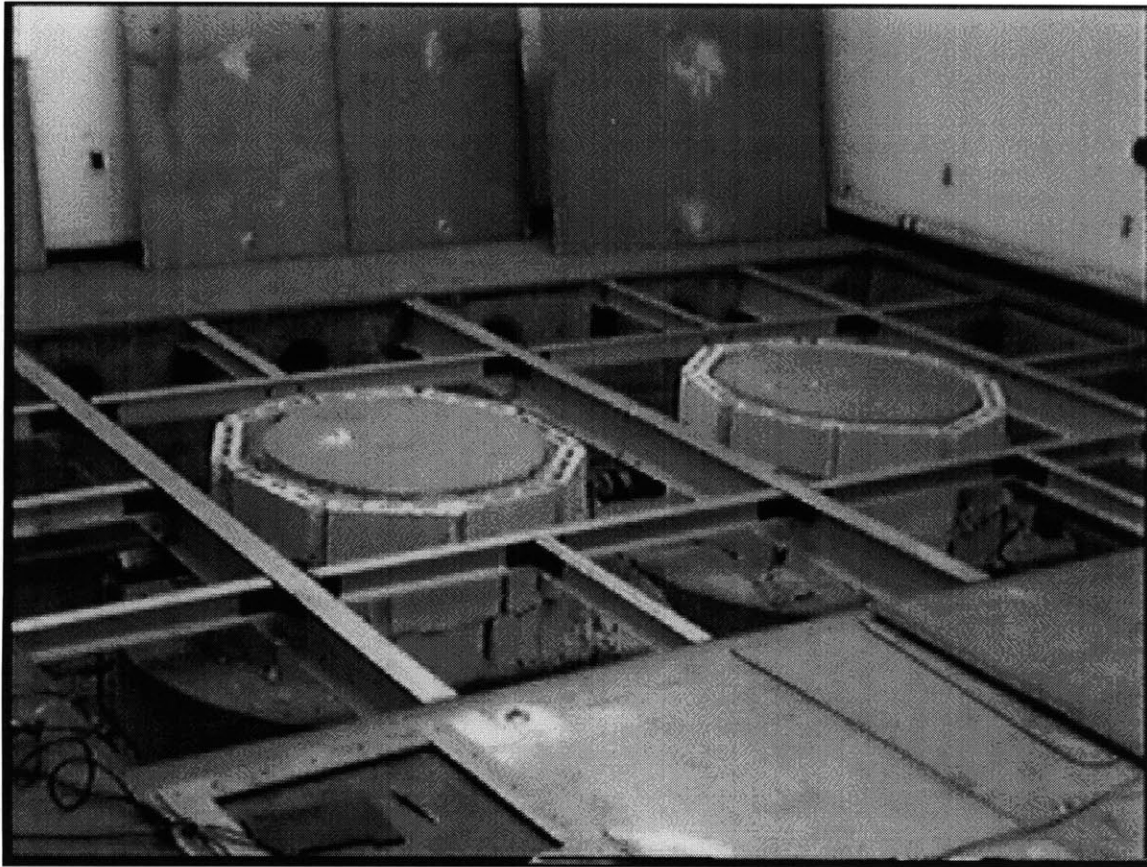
(Bain) Exposed girder system of the Live Room with two vibration isolation pads, floor plates removed
